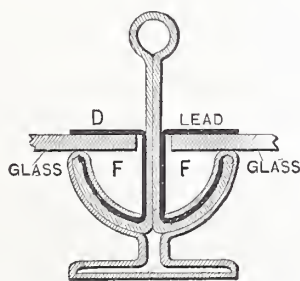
Enlarged Section Through the Pennycook Bar.
